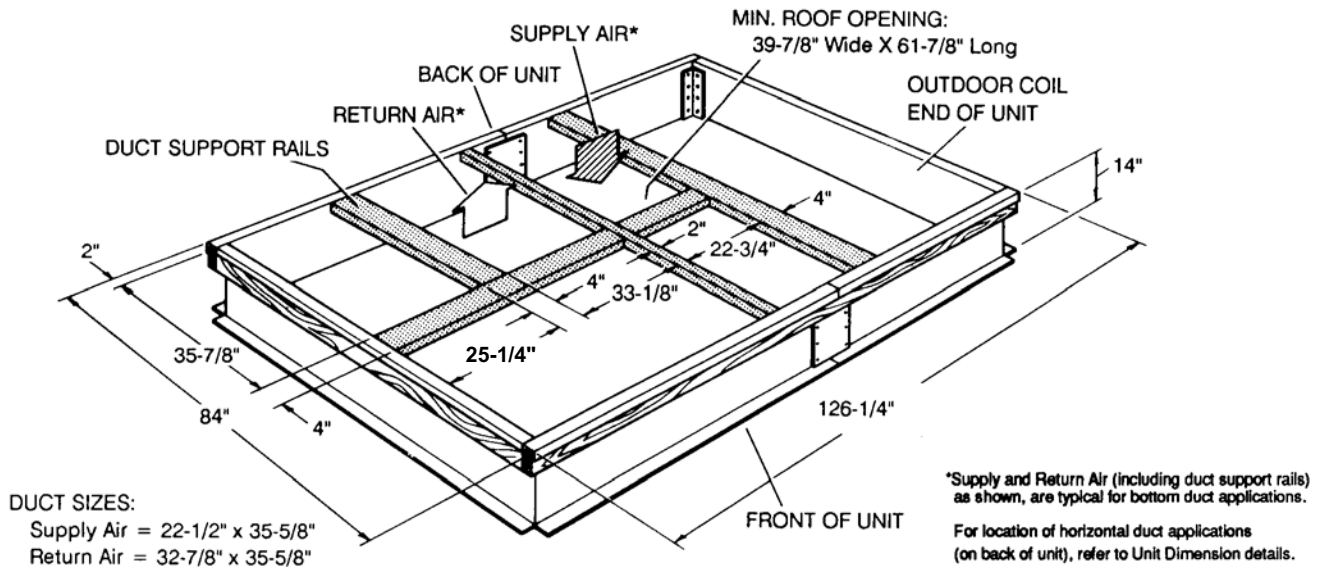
UNIT ROOF CURB DIMENSIONS
